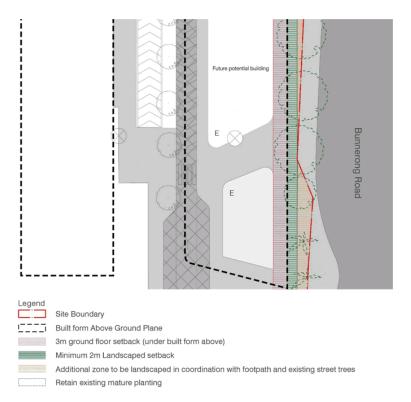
Illustrative master plan showing pedestrian access and a landscape buffer along Bunnerong Road (future plan)
